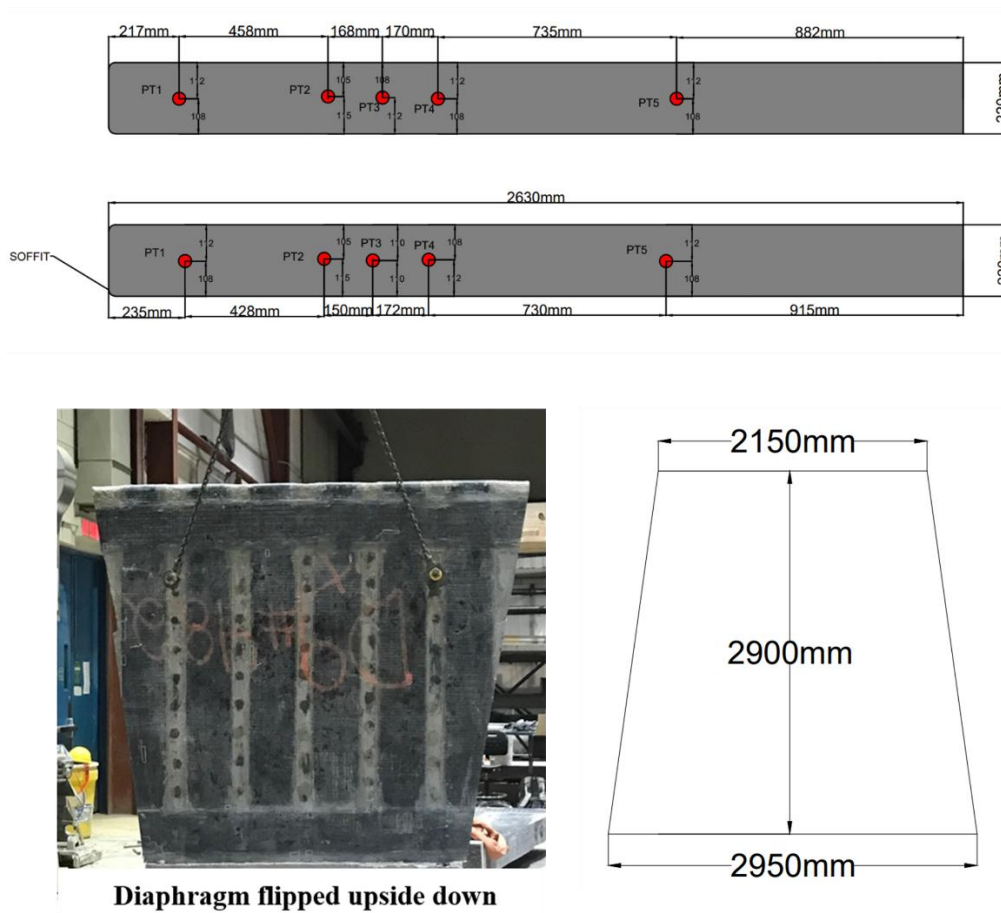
As-is geometrical dimensions of diaphragms a) Tendon spacing side view b) Plan view
